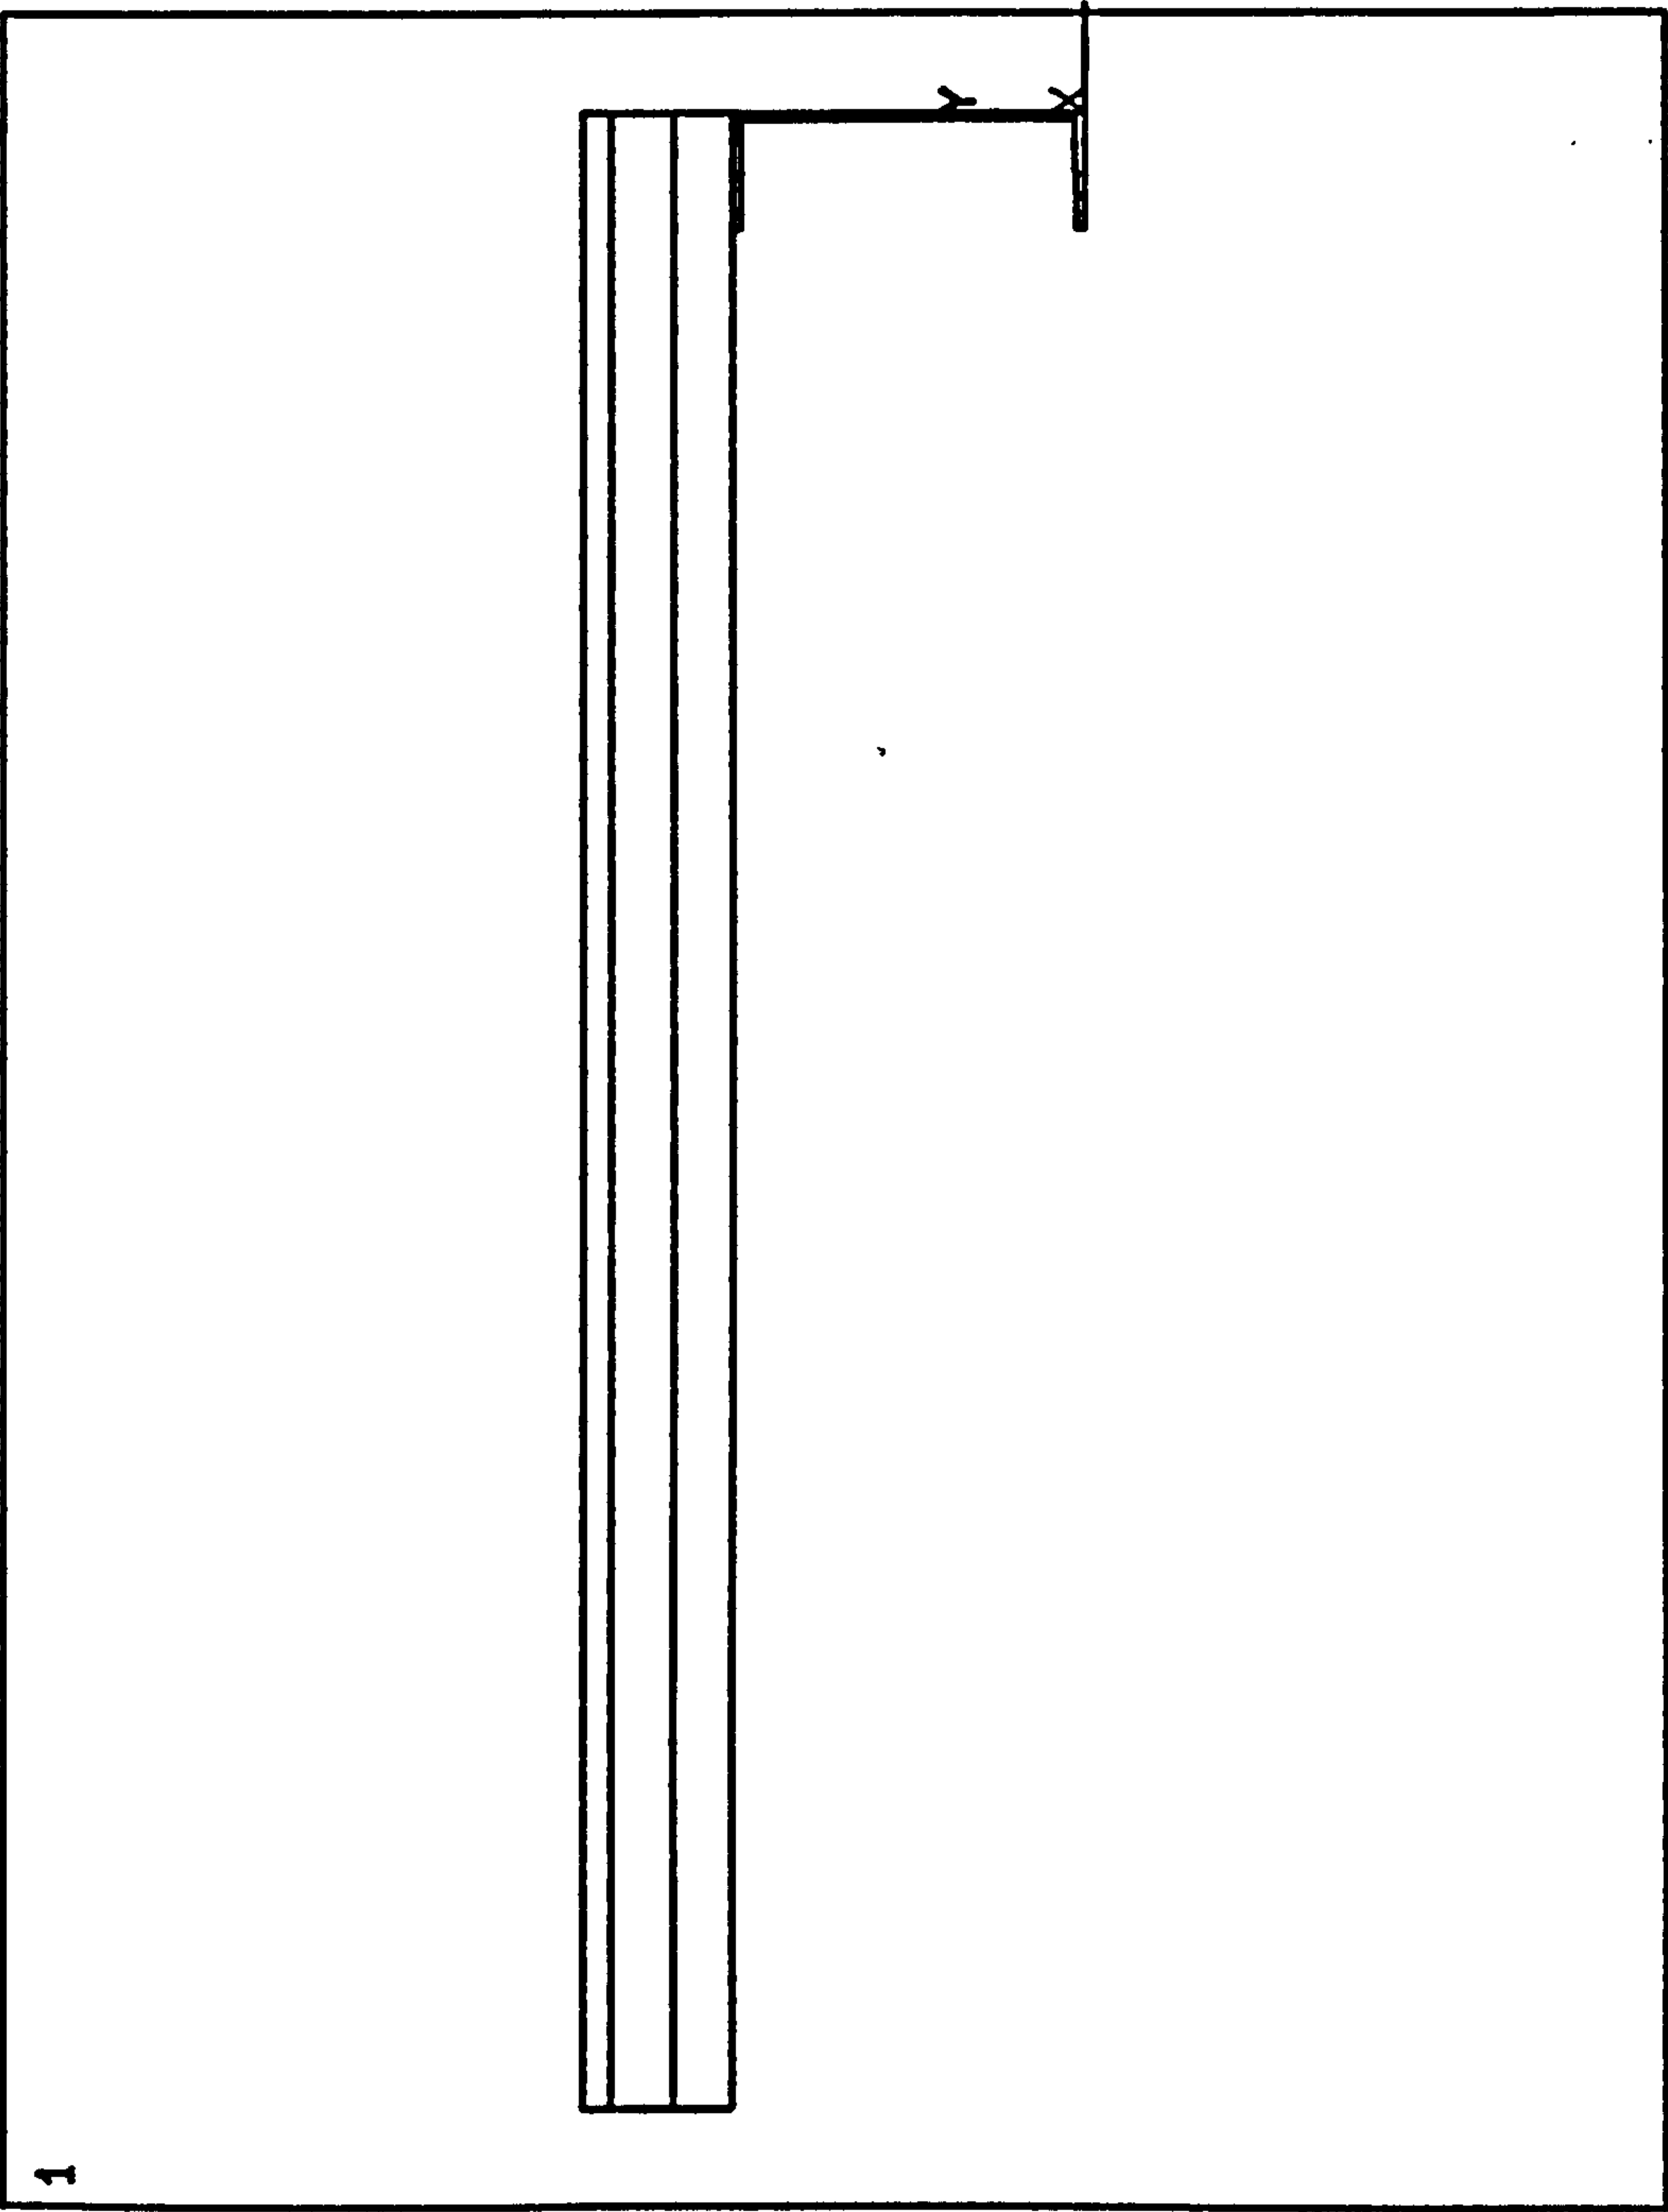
CROSS-SECTION OF THE COMPOSITE BEAM
